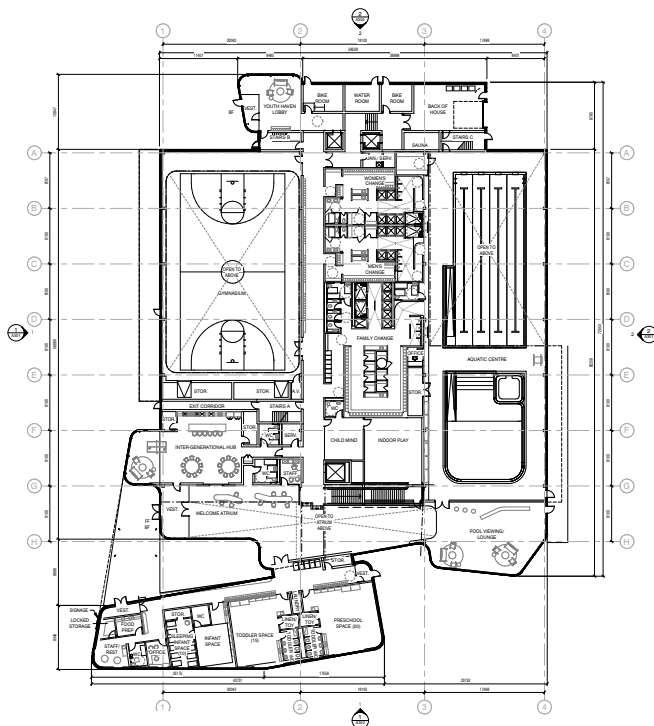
Proposed Site Plan by Martin Simmons Sweers Architects
